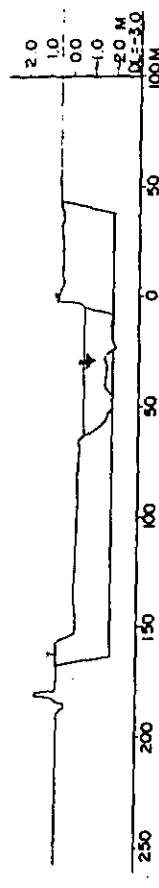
(1) PROPOSED CROSS-SECTIONS FOR URGENT PLAN
